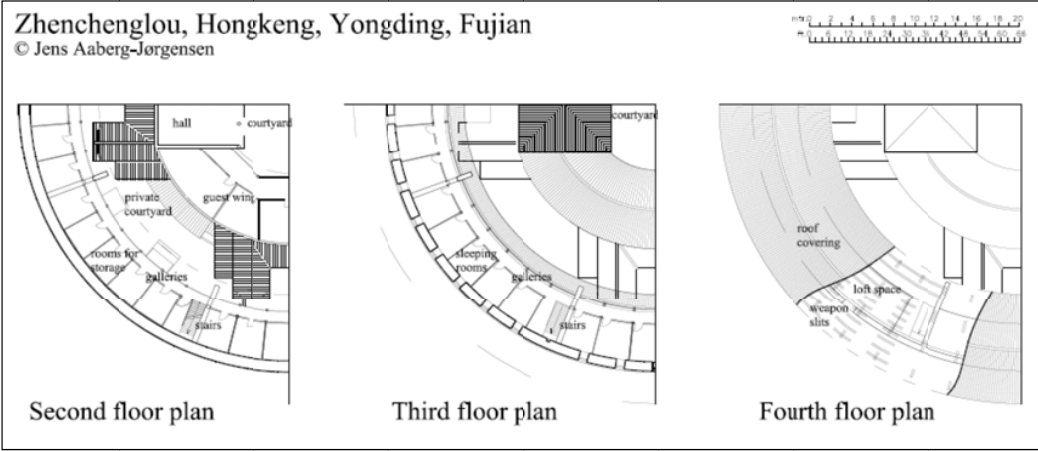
The 2nd- 4th floor plans of the circular earthen form.
